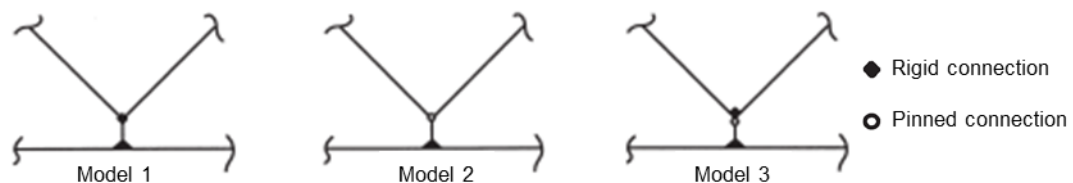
Detail of model connection for lattice girders (SAIDANI 1998).
